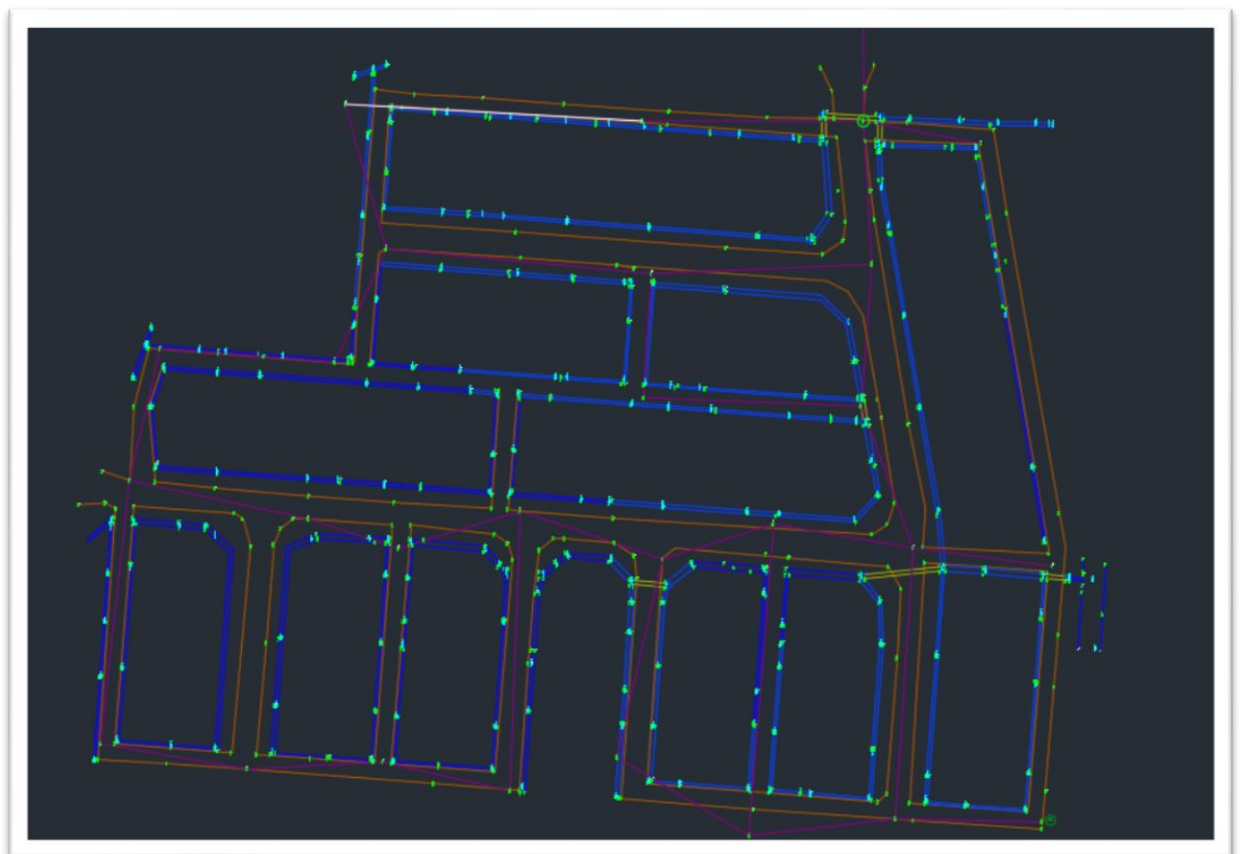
Layout Plan for Section 1, Bandar Baru Bangi
